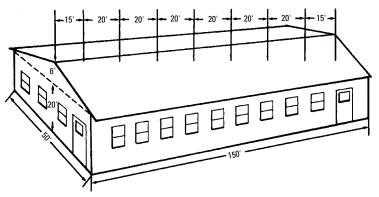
Typical building illustrating method of calculating number and size of ventilators required.
